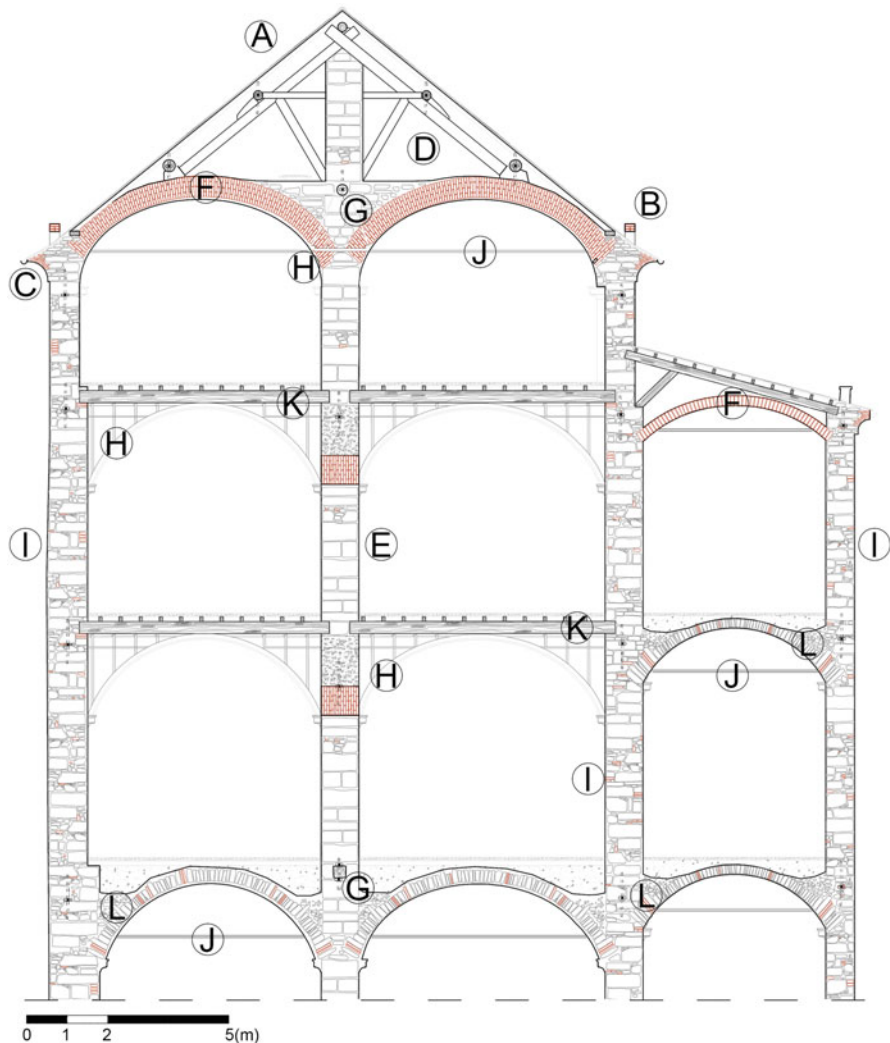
Vertical section of the north-west wing, from the second level to the top. (a) roof covering in slate plates (*abbadini*); (b) *muretto d'attico* (a short wall located on the roof coating nearby the eaves); (c) eaves; (d) wooden roof structure; (e) pillar in blocks of carved stone; (f) arch in solid bricks; (g) wooden beam used as tie rod between two pillars; (h) wattle vaults and its structure; (i) bearing wall with large-sized splitted stone elements and flakes; (j) iron tie rod; (k) wooden floor; (l) vault in hewn stone
